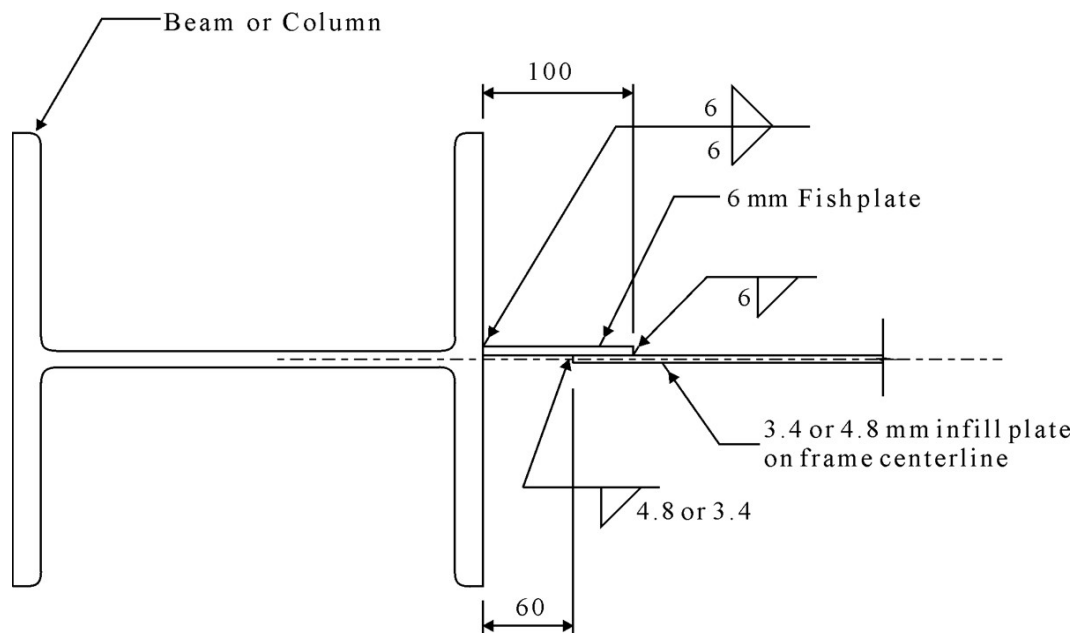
2: Fish plate detail used for connection of infill plate to the frame (Behbahanifard et al., 2003)
